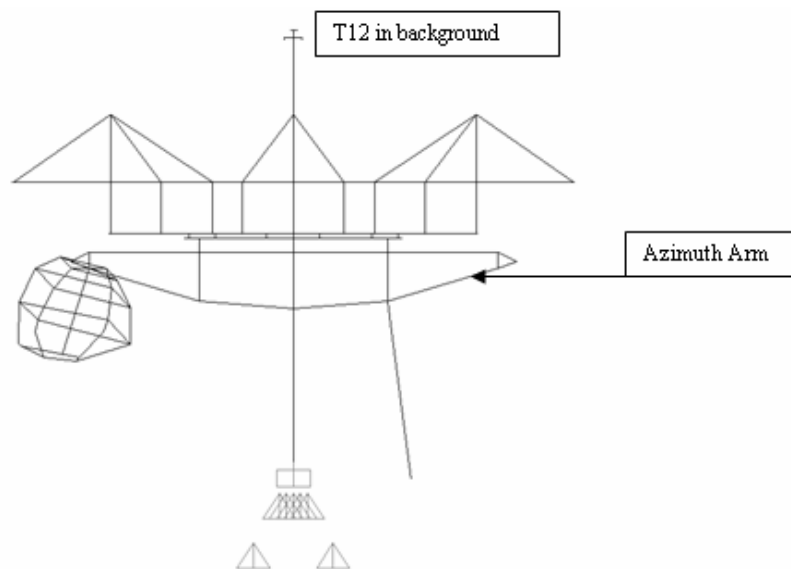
Elevation view of platform in Model C looking towards tower T12
